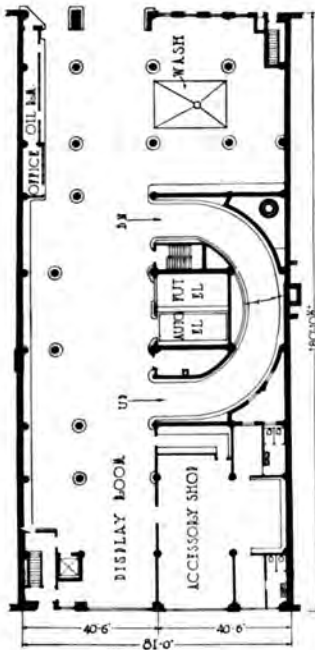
First Floor Plan, LaSalle Garage, Chicago
